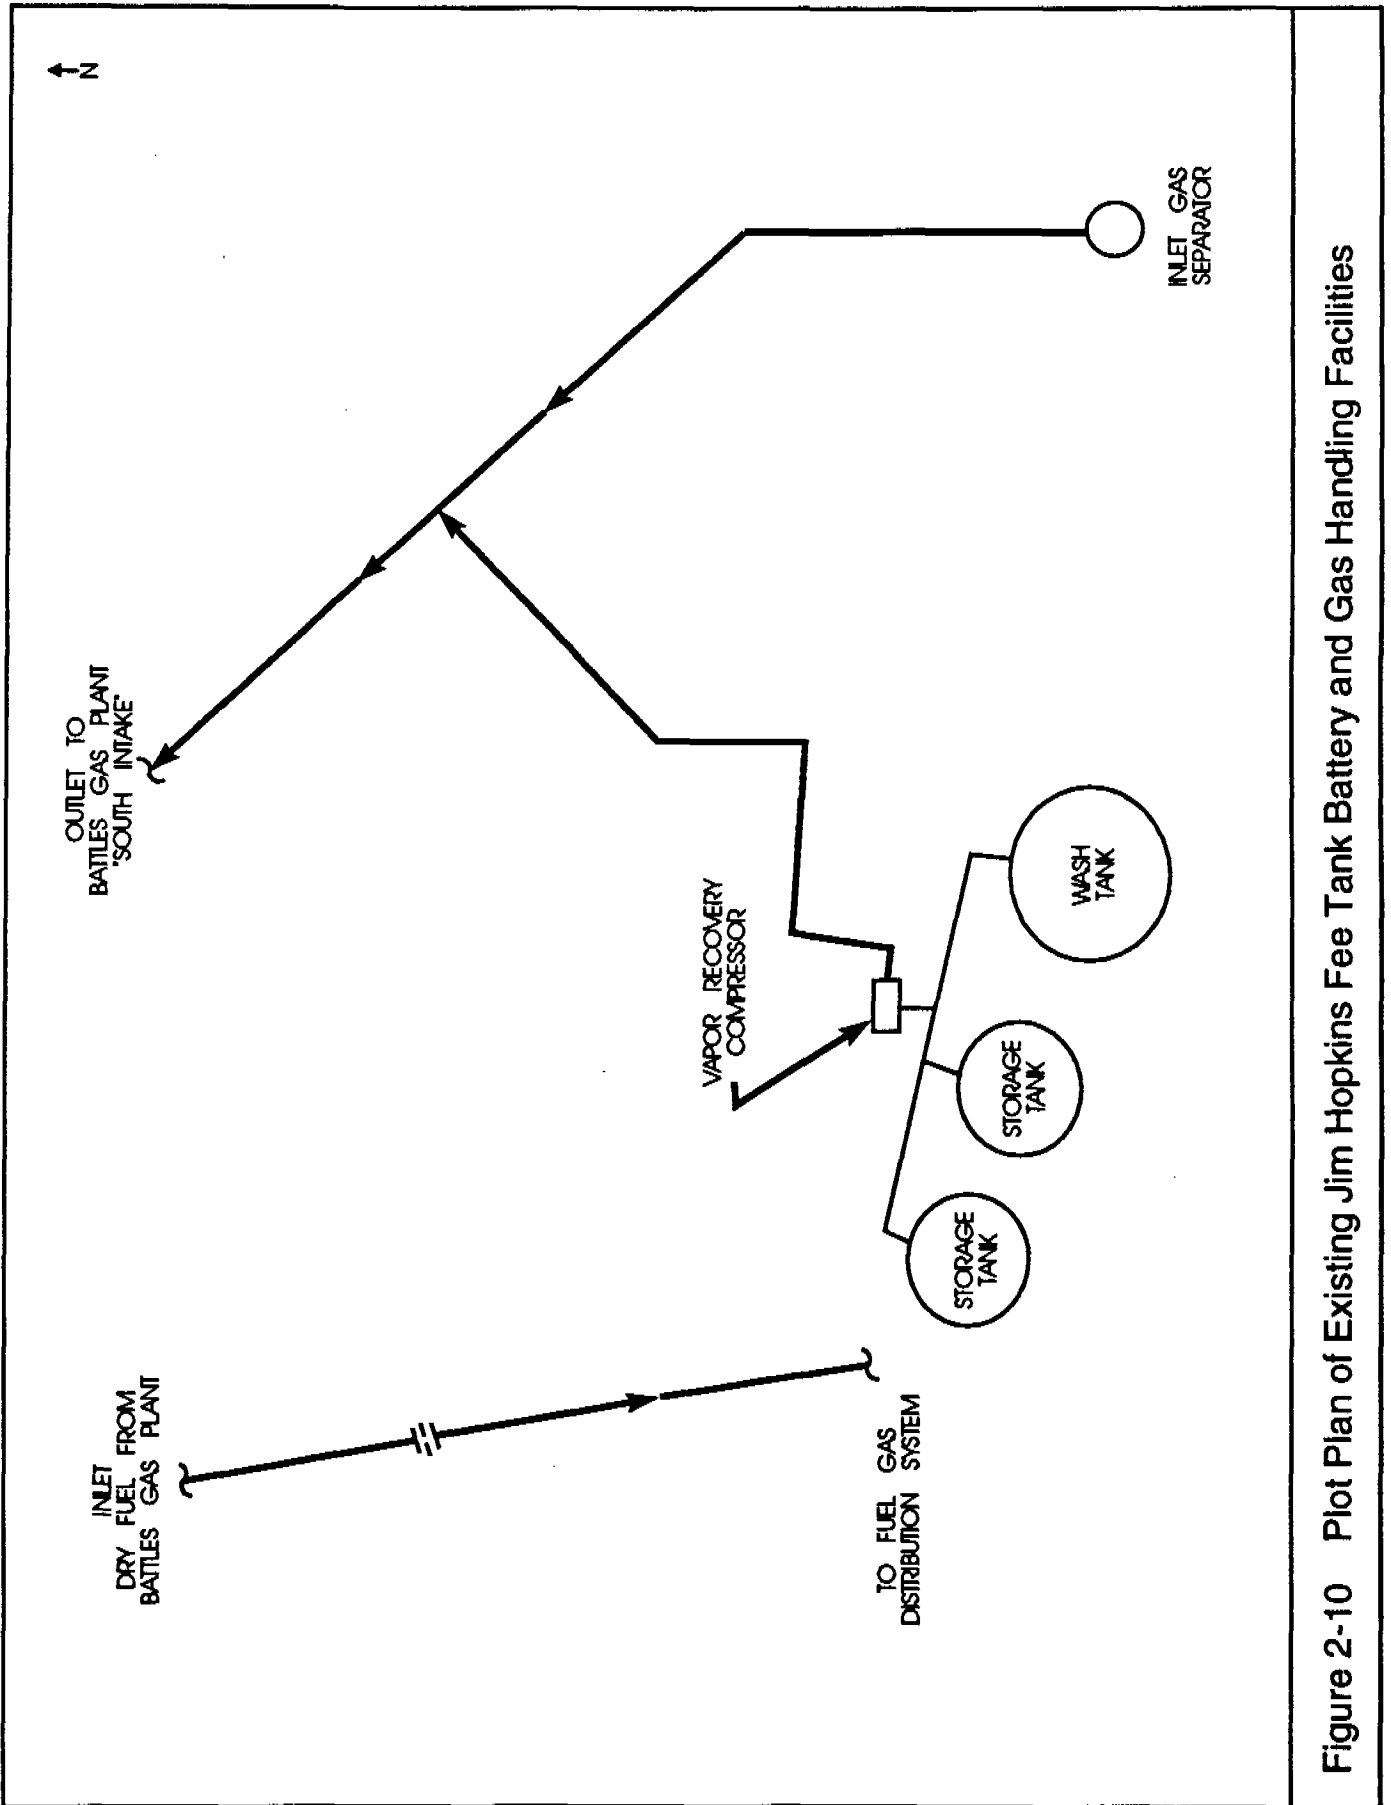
Plot Plan of Existing Jim Hopkins Fee Tank Battery and Gas Handling Facilities
